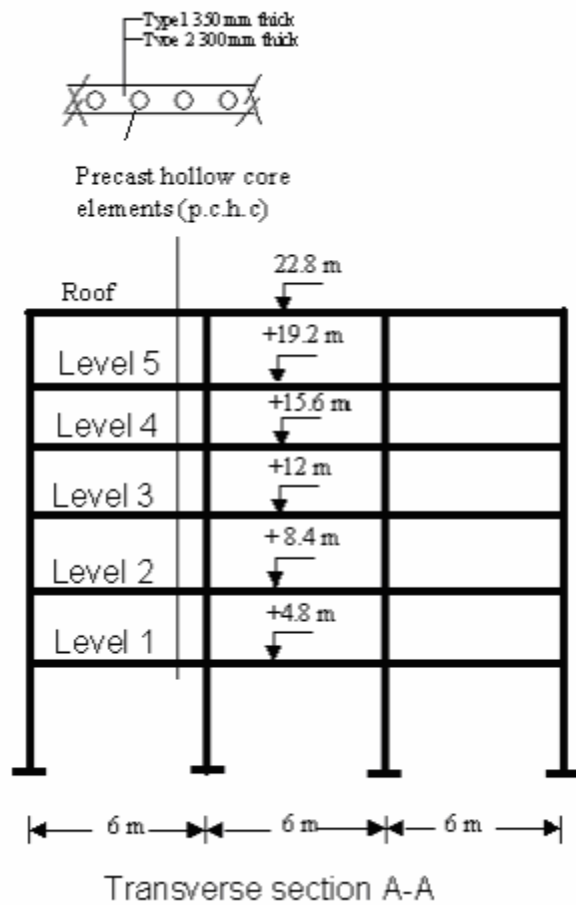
Vertical transverse section in the 6 story precast concrete building
